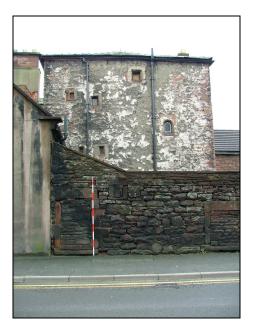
North-east elevation of pele tower, note the blocked windows in the boundary wall which may relate to a now missing building located against the north-west wall of the cottage
